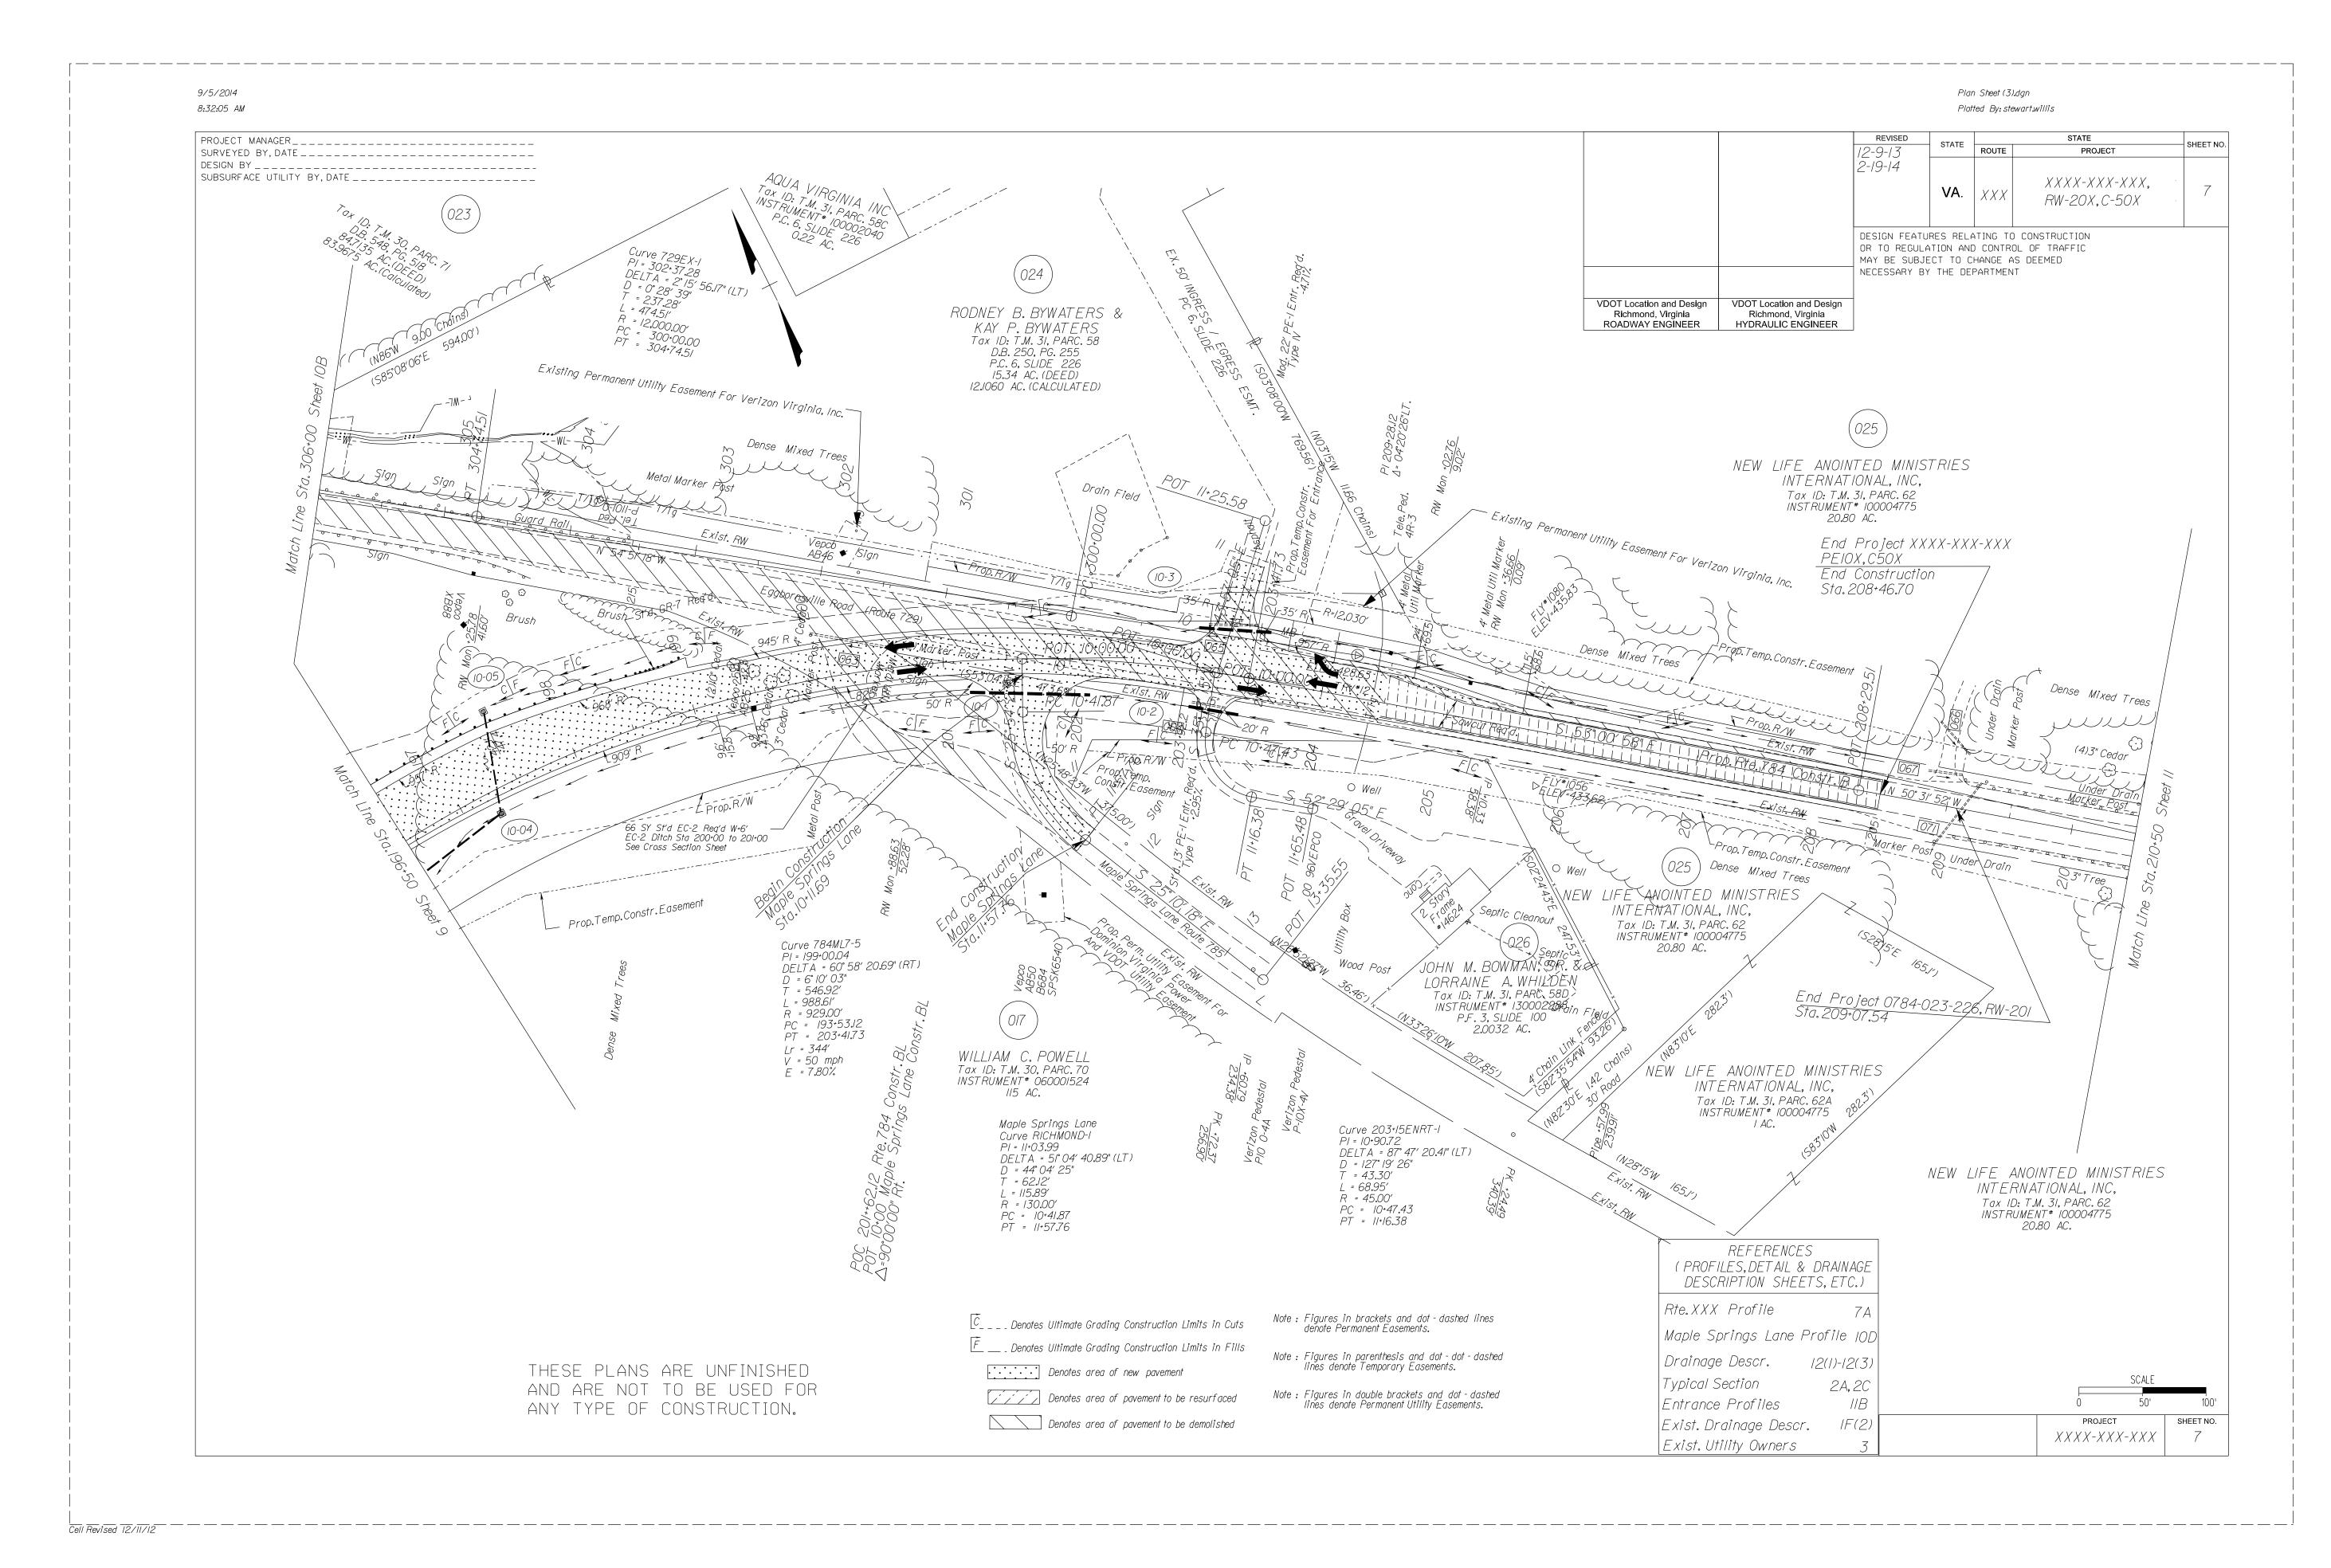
H - 33 SAMPLE 3 PLAN SHEET
